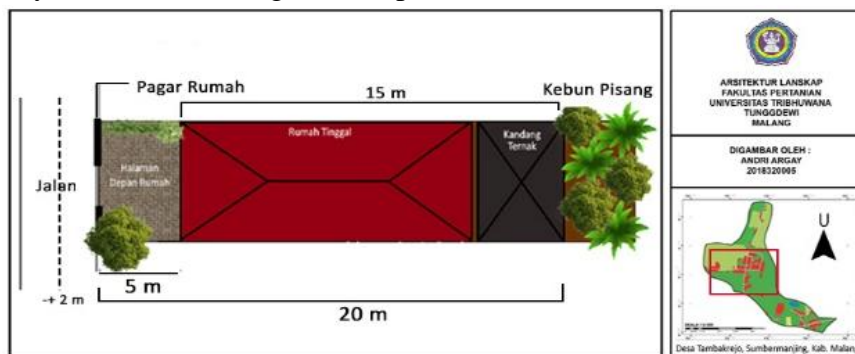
Site Plan of Residential Units in the Central Area of Sendang Biru Hamlet
